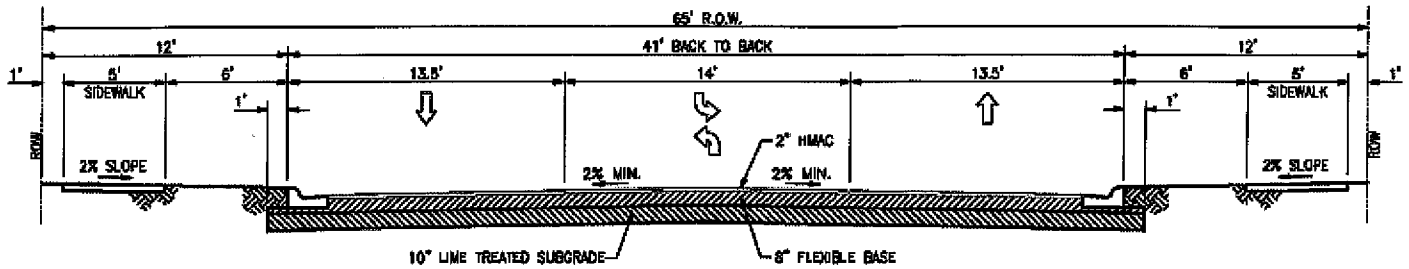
C-1 RESIDENTIAL COLLECTOR
